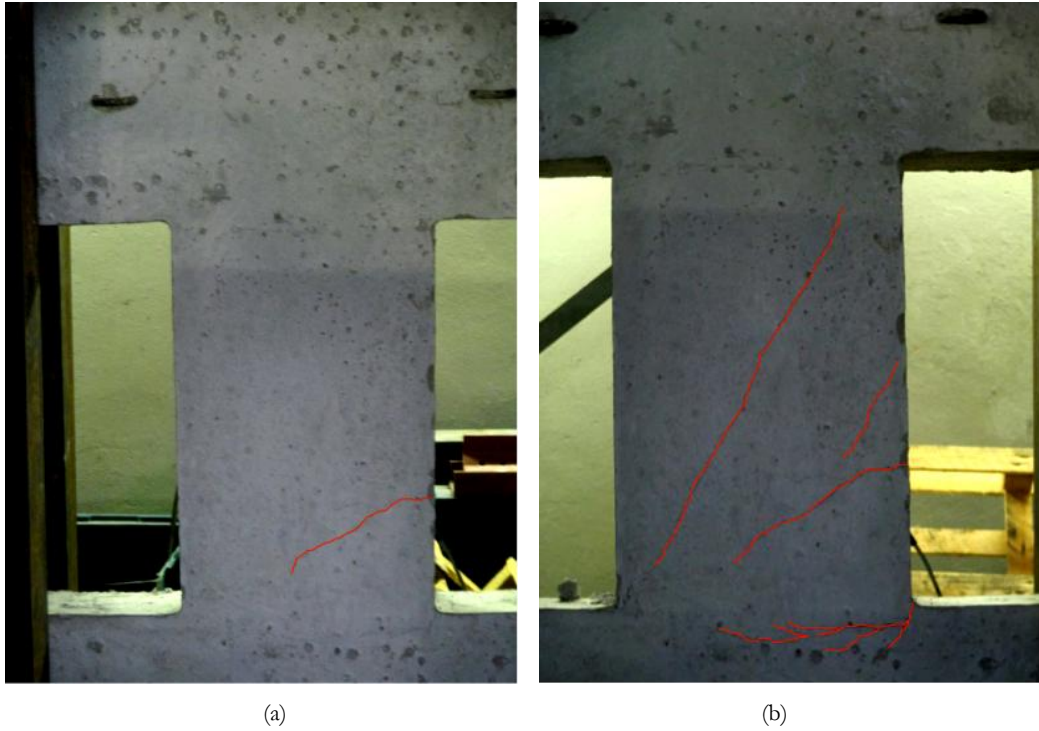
Coupling beams with complete reinforcement under monotonic loading: (a) crack initiation and (b) multiple cracks formation
